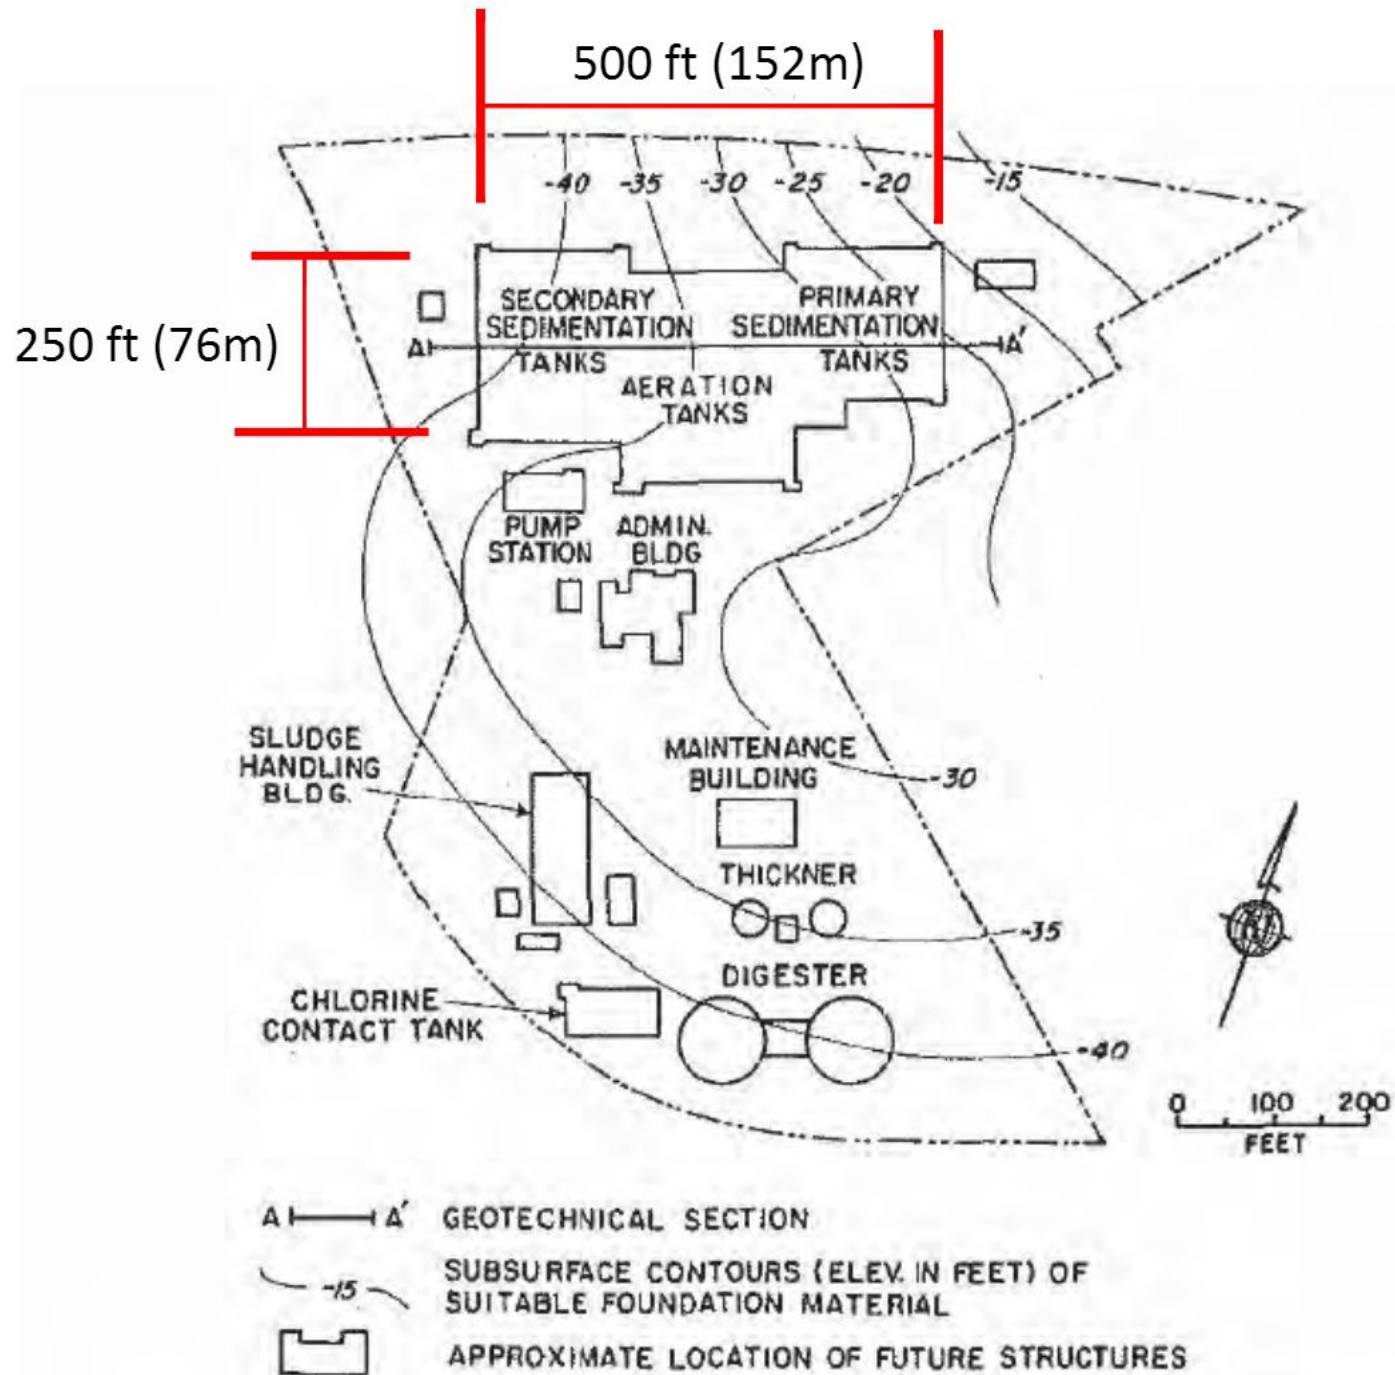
Site Plan—Santa Barbara Wastewater Treatment Plant
